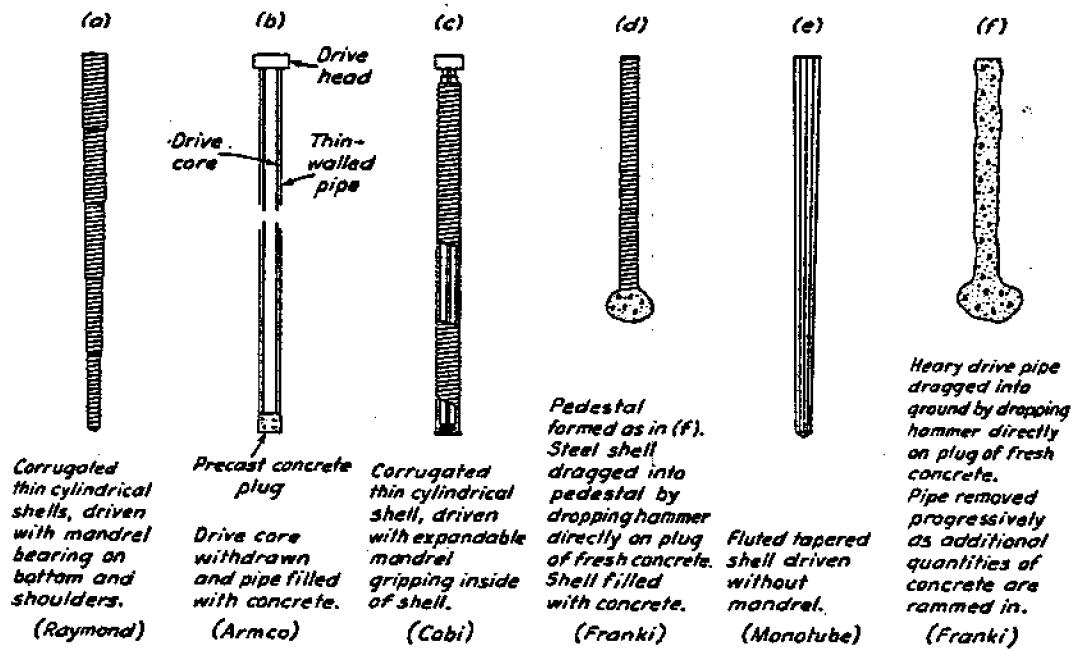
Examples of Cast-in-Place Concrete Piles
